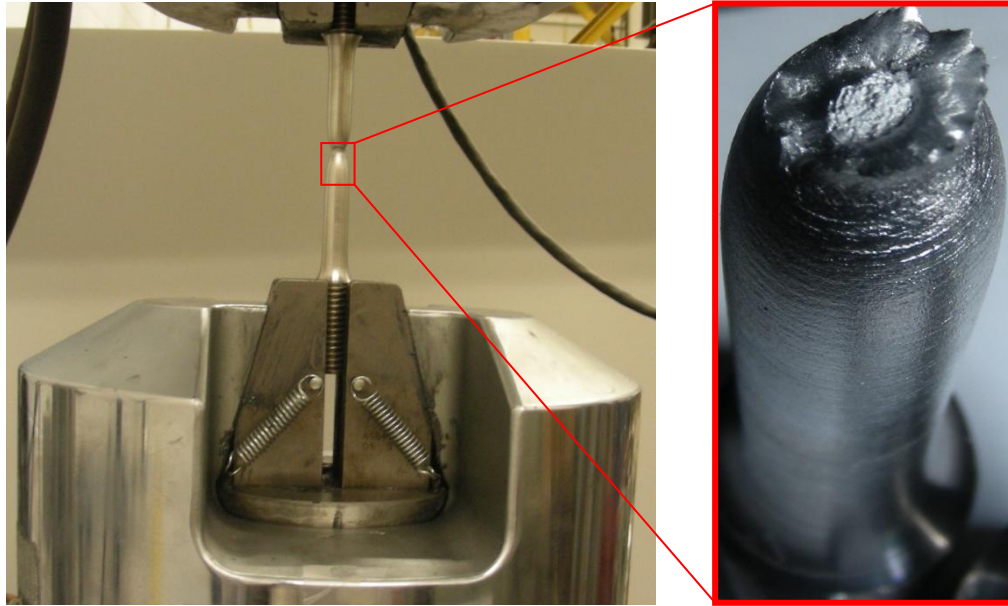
Tensile fracture surface of A307 anchor rod
